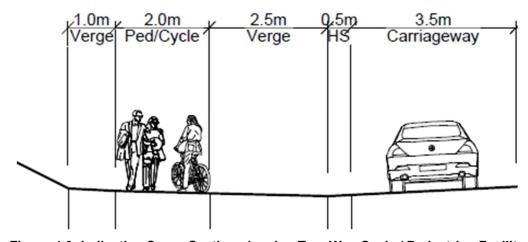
Indicative Cross-Section showing Two-Way Cycle / Pedestrian Facility
